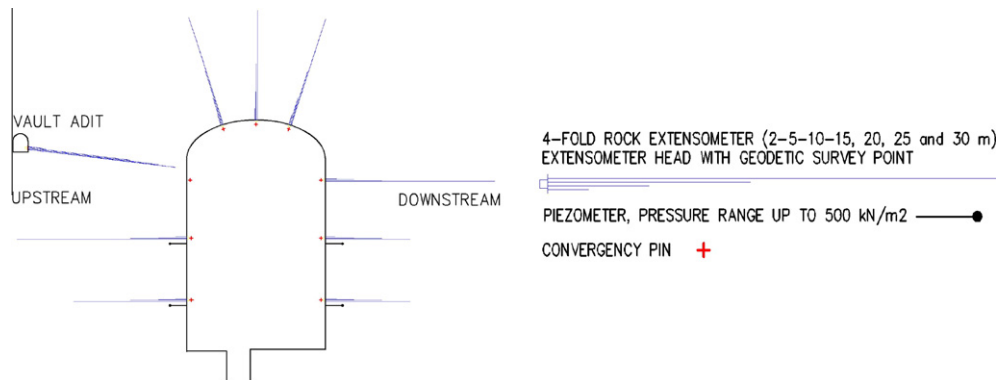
Typical instrumentation array installed in the powerhouse cavern (chainage 67, Section 3).
